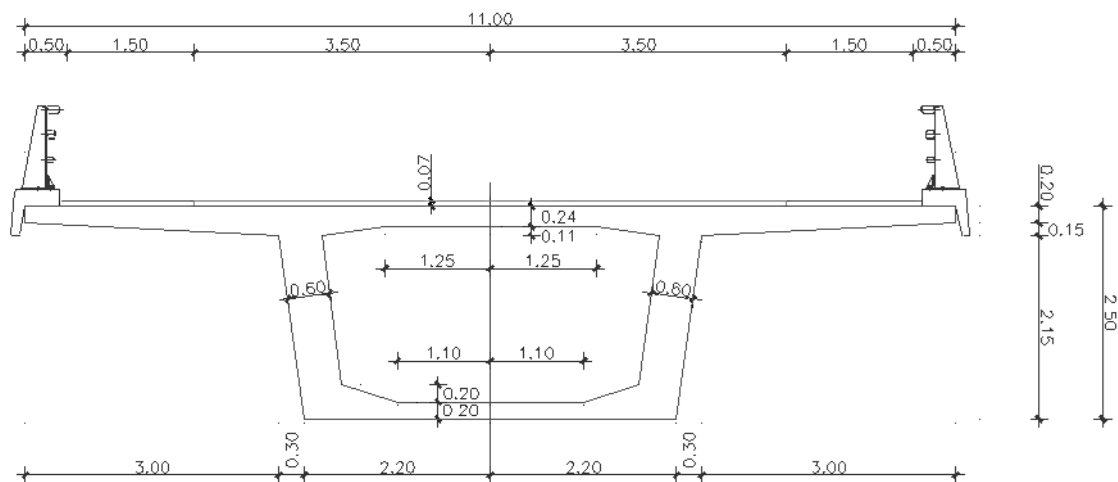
Río Gabriel Bridge - Cross-section at mid span
